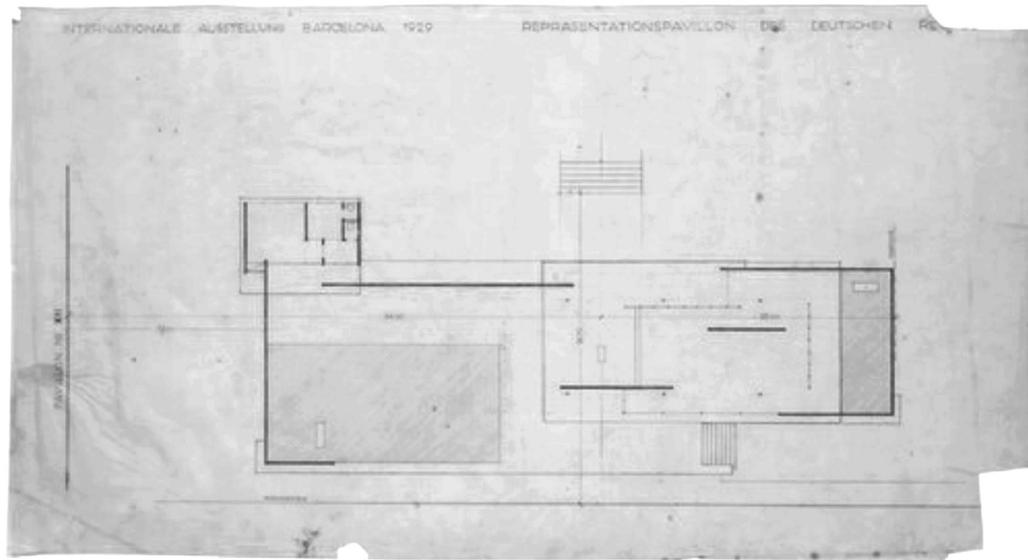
Floor plan of Barcelona Pavilion on tracing paper.
